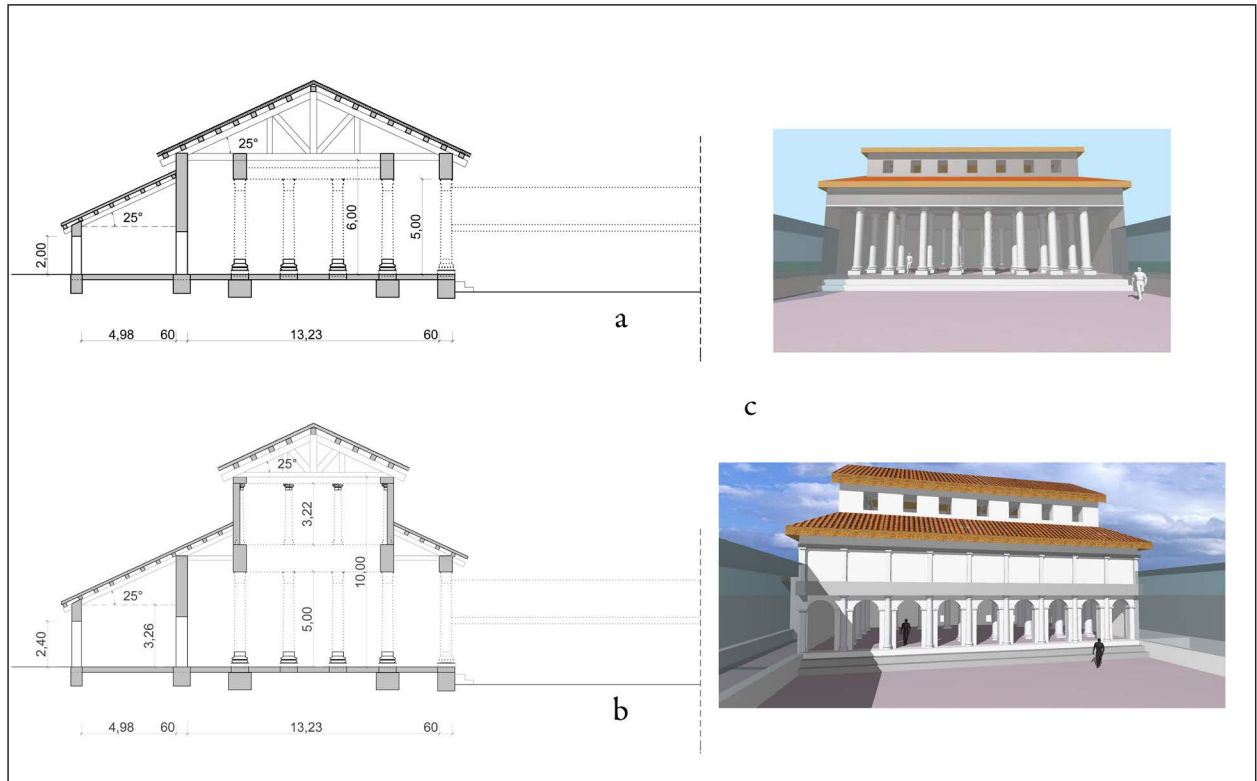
Basilica: a: cross-section with the lowest estimated wall heights, b: cross-section with the highest possible walls, c: two reconstruction versions.
